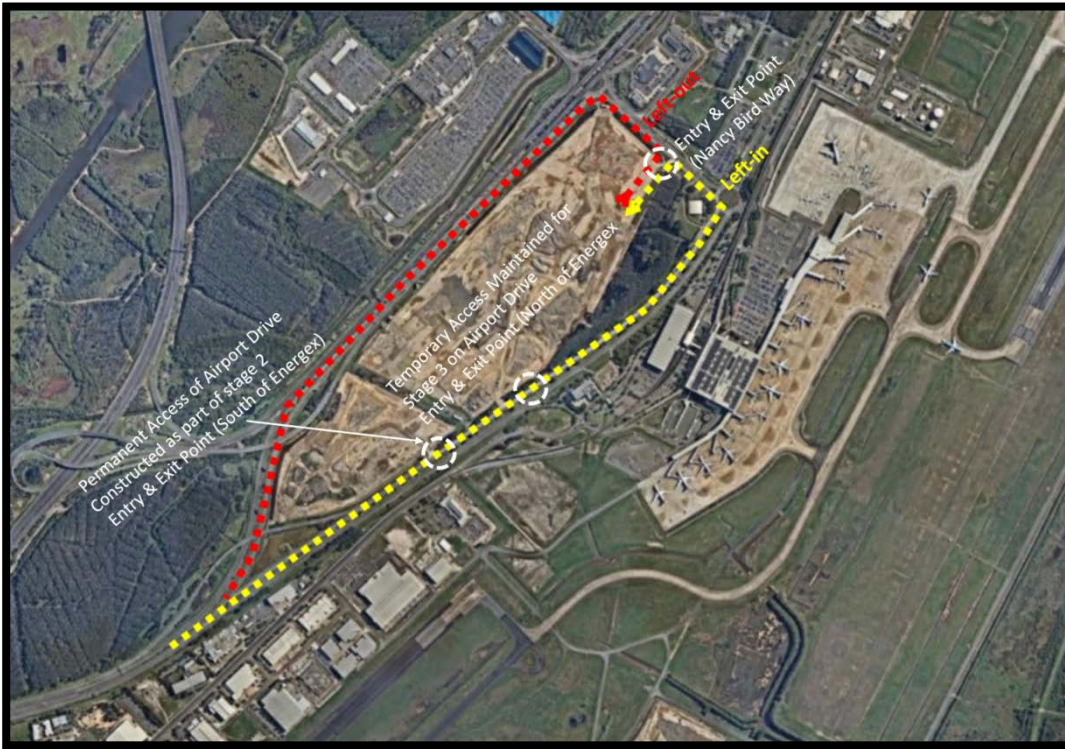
Construction routes from north and south accessing the site from Nancy Bird Way (left-in, left-out)
